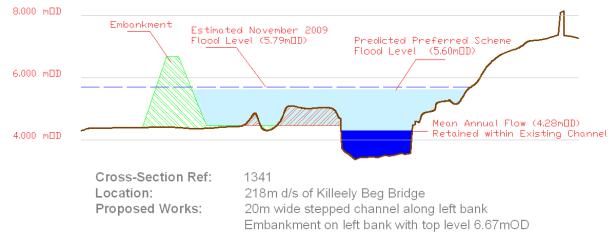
Typical Cross Sectional Detail downstream of Killeely Beg Bridge
